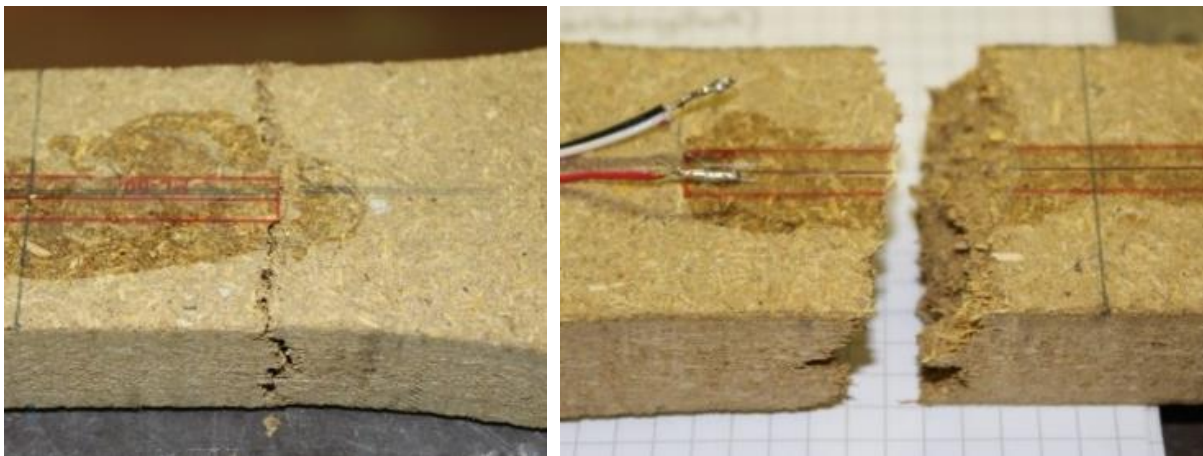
(Left) test piece 1 (Right) test piece 2; failure under axial tensile load
